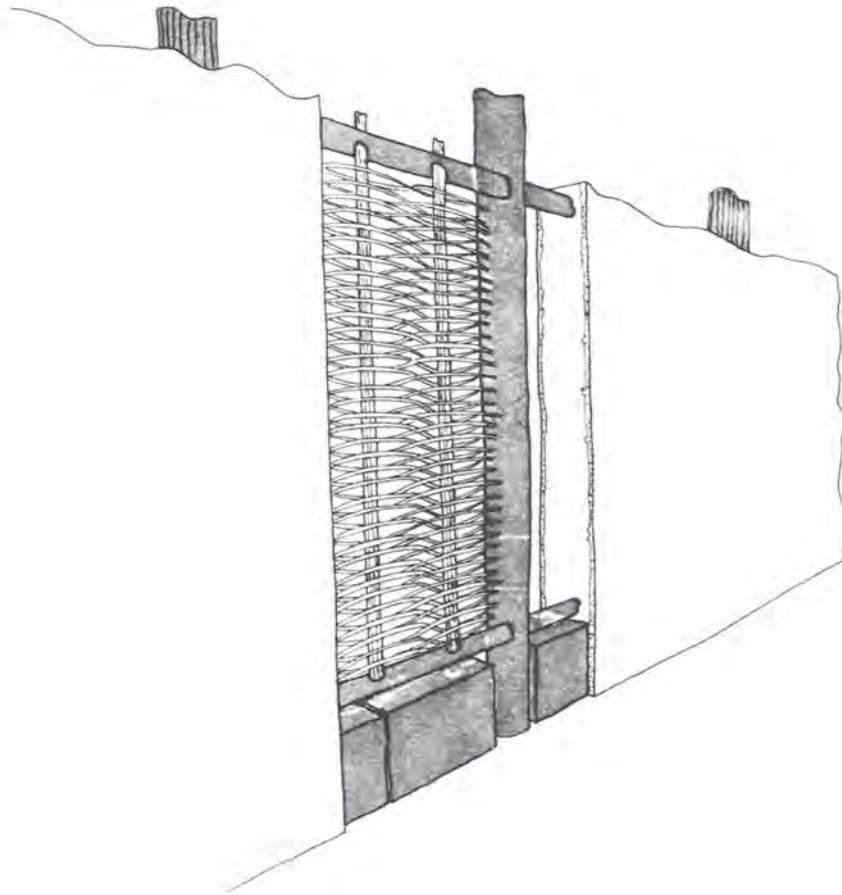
Wall construction. After no. 4 in “Disegni e piante” in Gli Etruschi.
